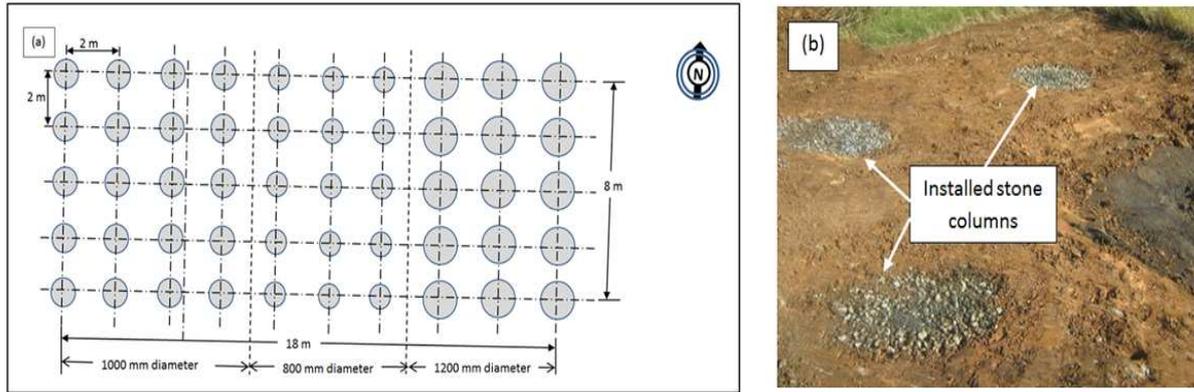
The installed test columns: (a) Plan. (b) Photographic view.
